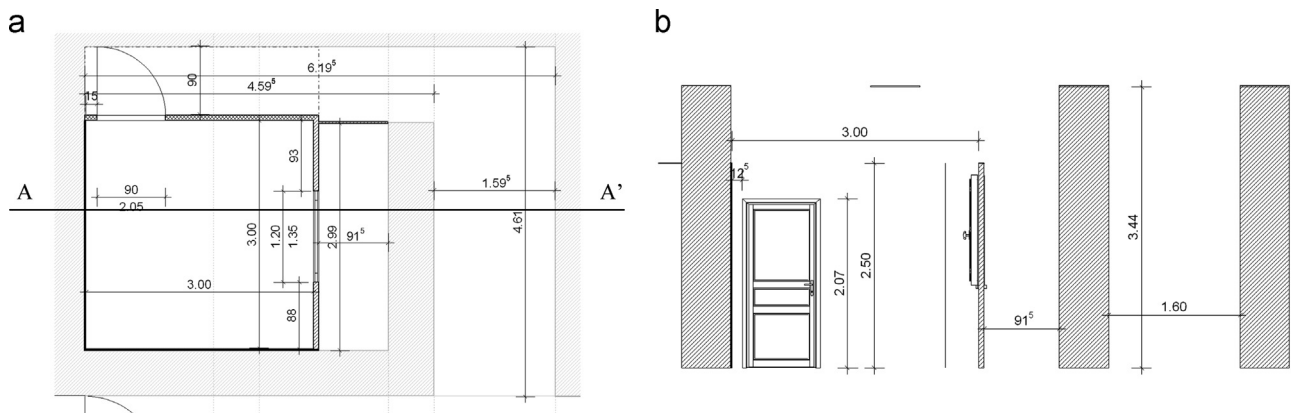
Top and cut sectional view of the test arrangement: (a) top view, (b) cut sectional view according to A-A'.
